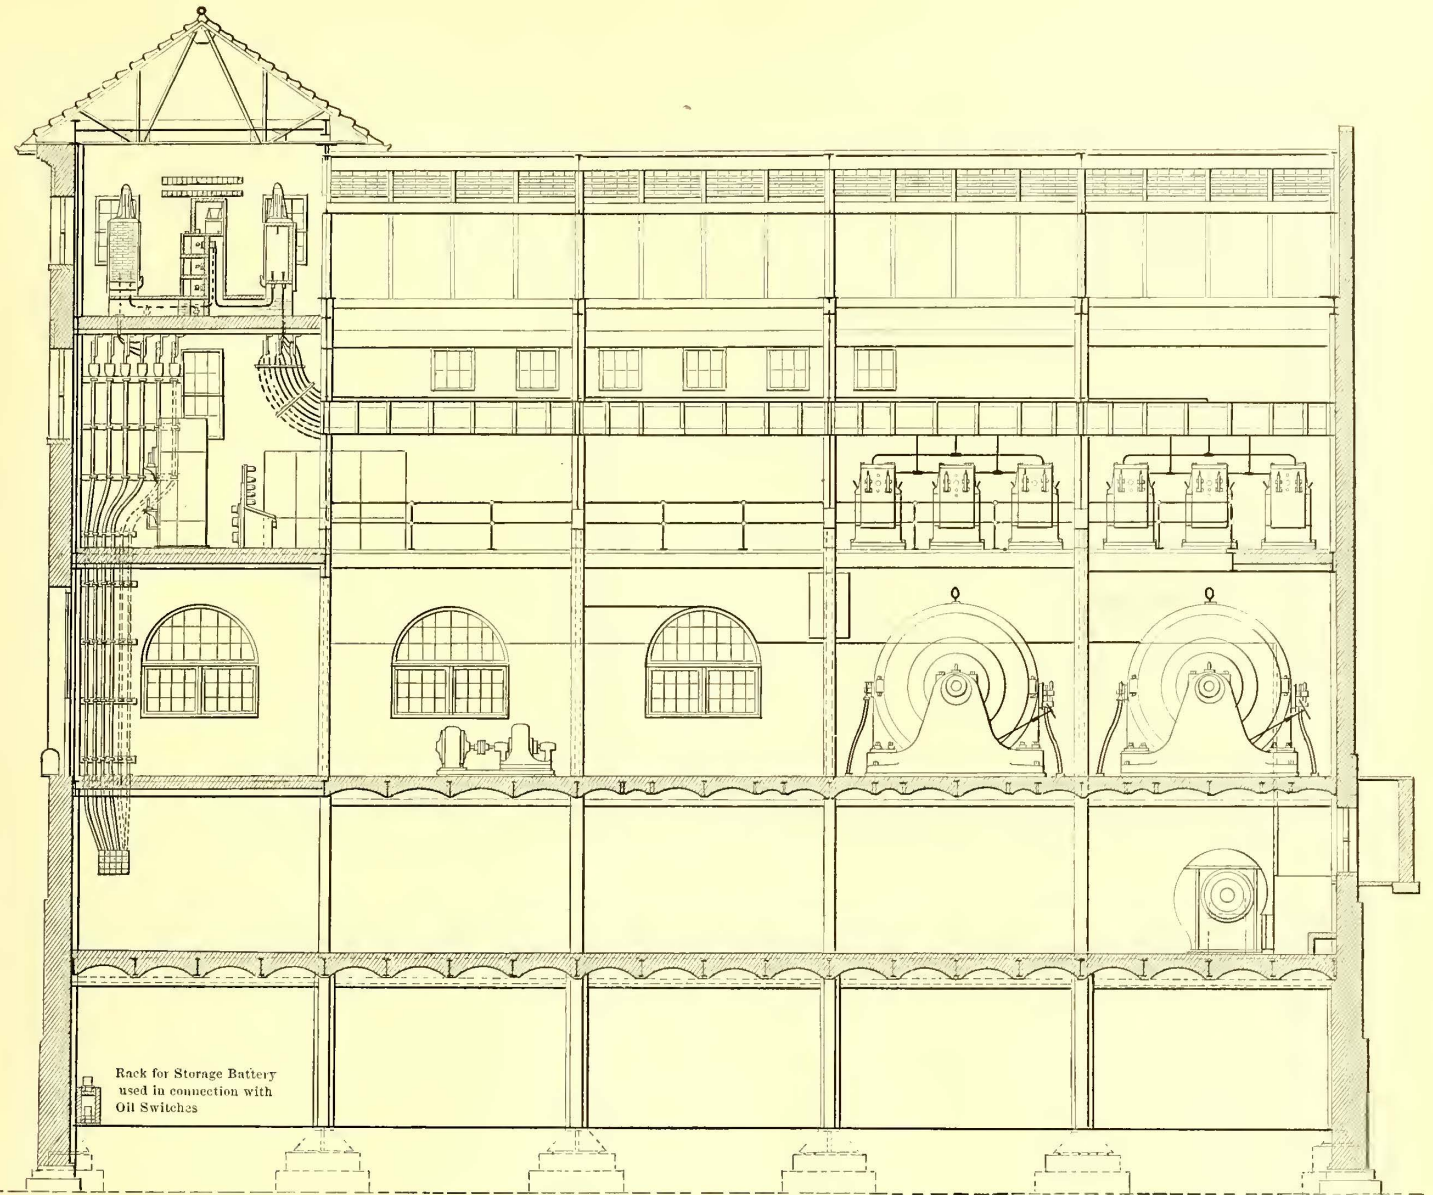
LONGITUDINAL SECTION OF SUB-STATION NO. 4
